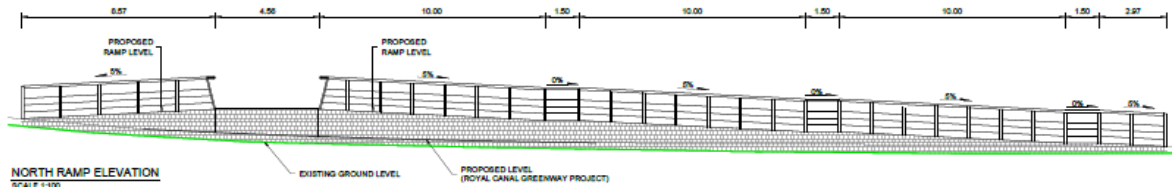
Elevation of Northern Ramp at Bridge Ballymun 03
